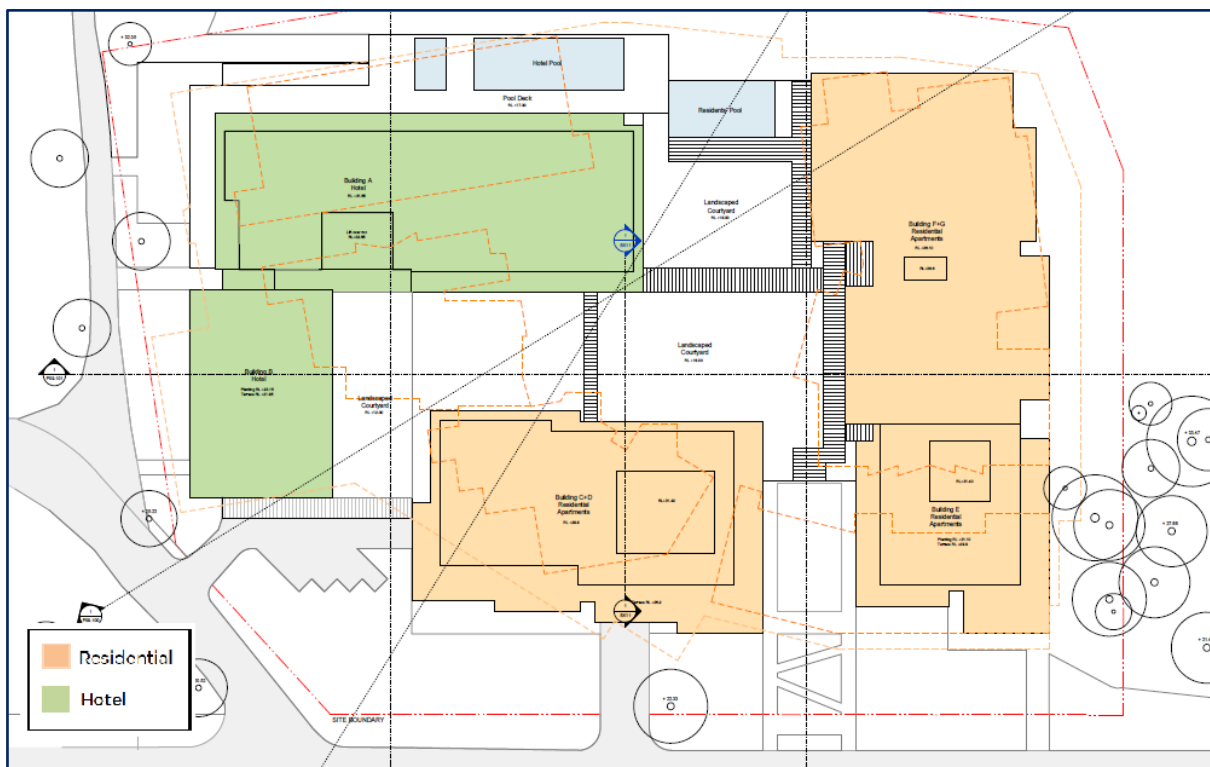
| Proposed Concept Plan Layout (MOD 4) (Source: Applicant's Modification Report)
